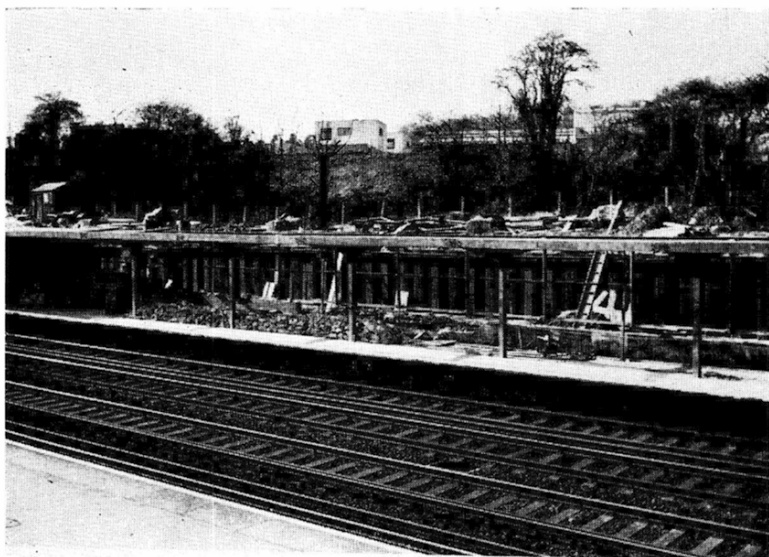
HONOR OAK PARK STATION—REMEDIAL PILING
